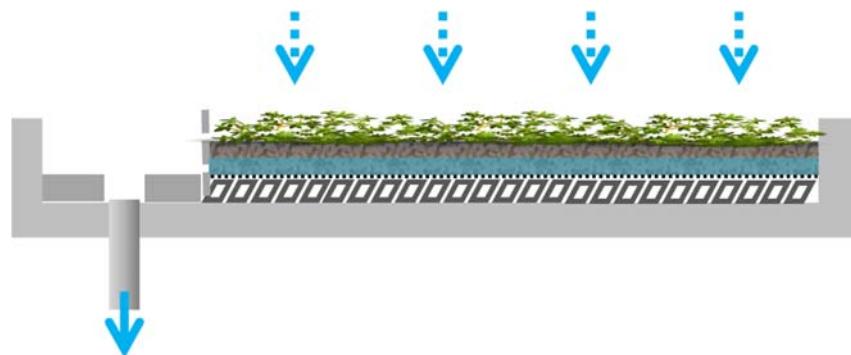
Conceptual diagram of a green roof where flow control and water storage is primarily provided by the planting medium used to support the vegetation.
